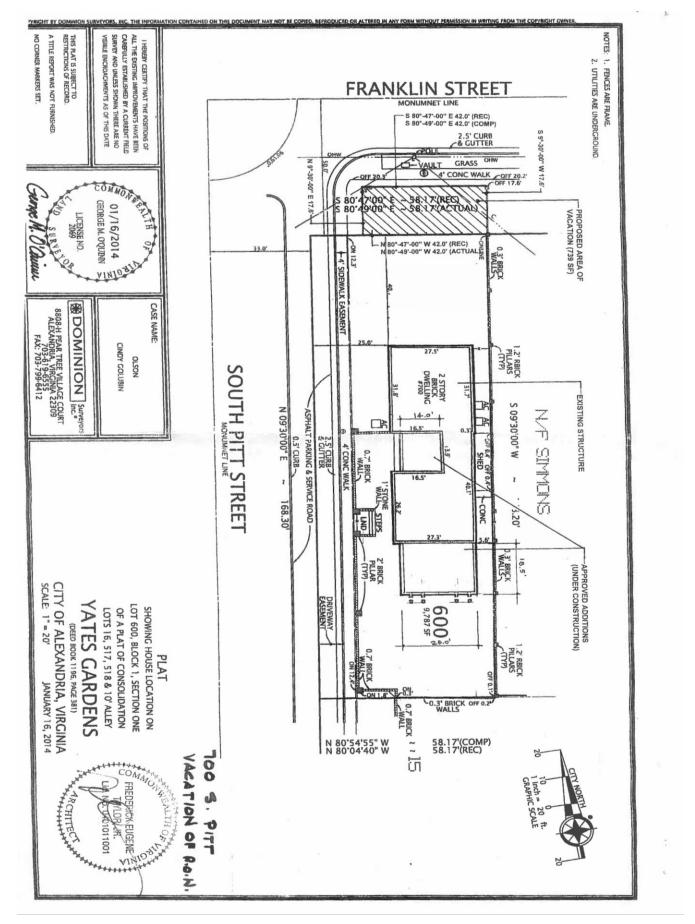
Plat of 700 S. Pitt Street showing proposed area of vacation.
